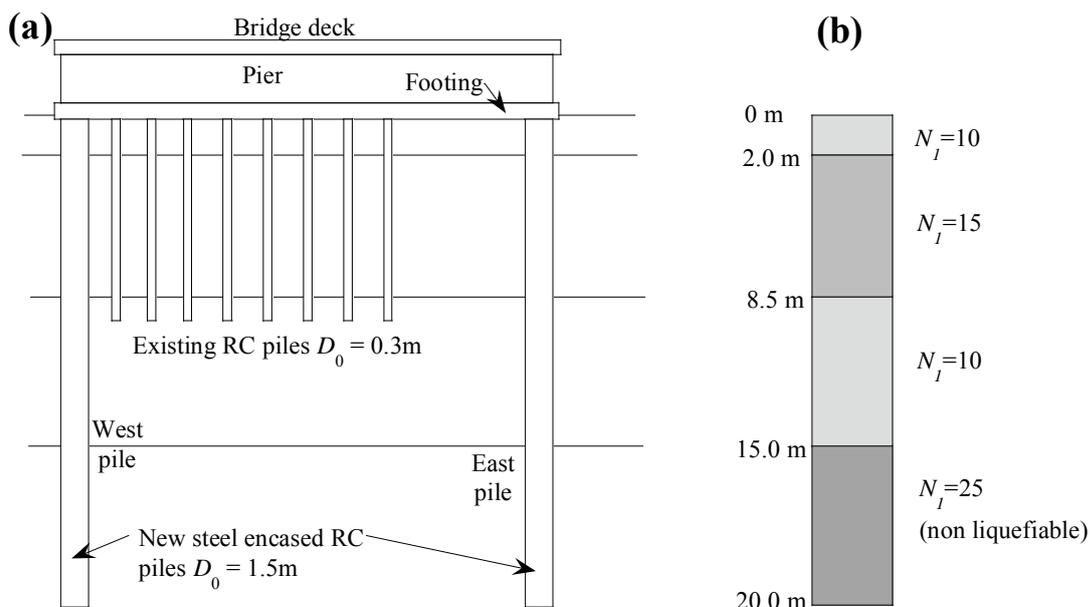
Central pier of the bridge: (a) cross section; (b) soil profile used in seismic effective stress analysis
